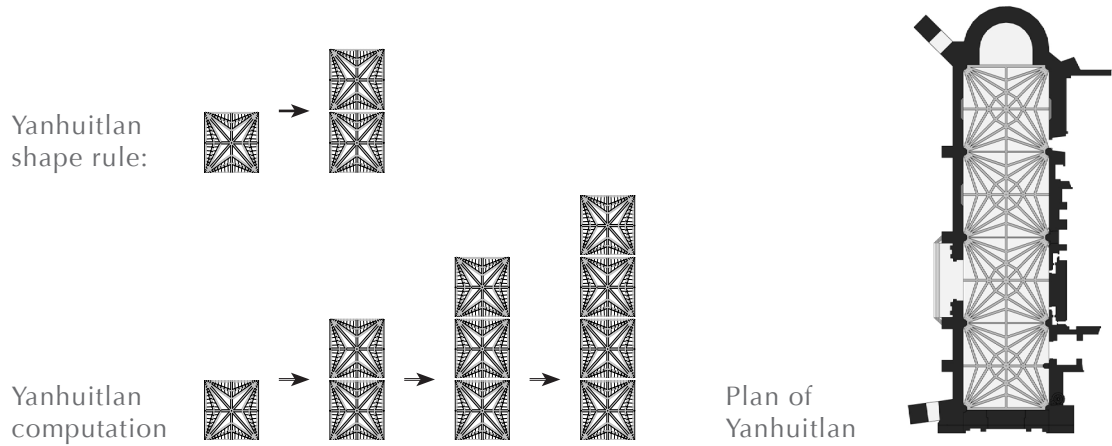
Shape rules using reflected ceiling plan at Santo Domingo Yanhuitlan.
